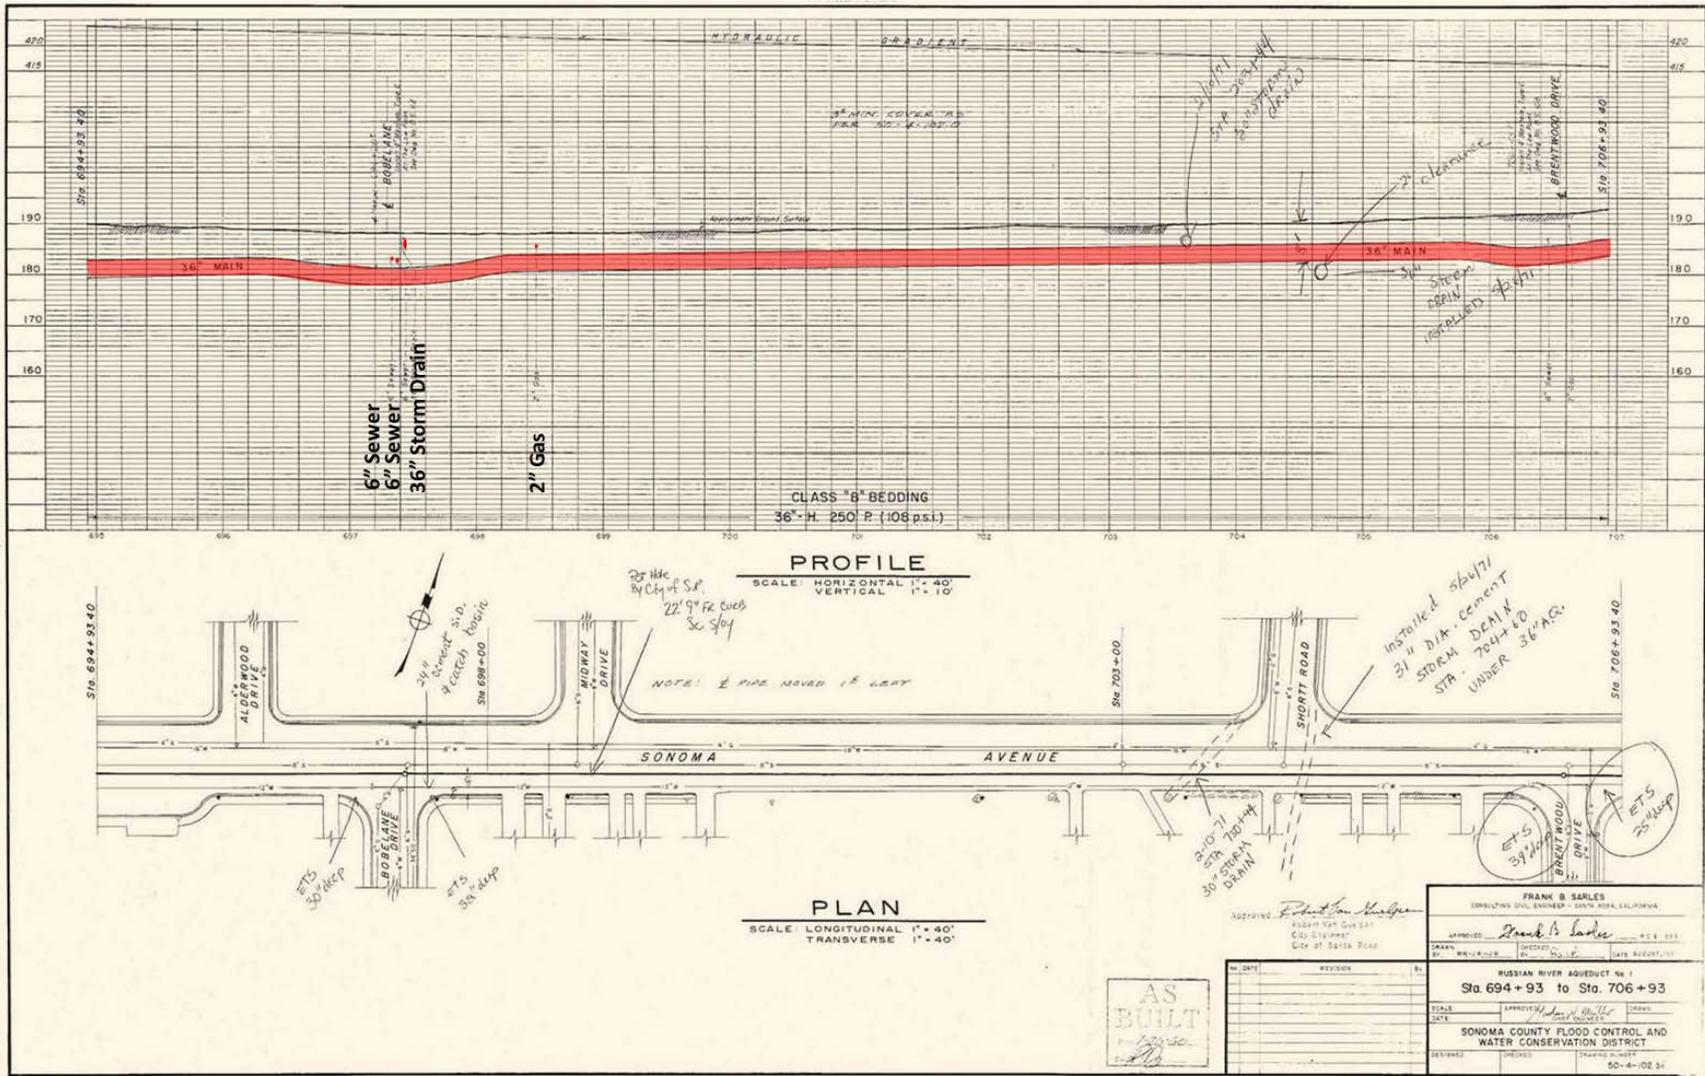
Plan and Profile of Existing Pipeline (3 of 3)
